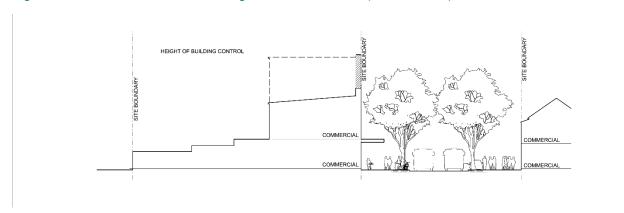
Street Cross Section - Regent Street Additions (Parapets)
